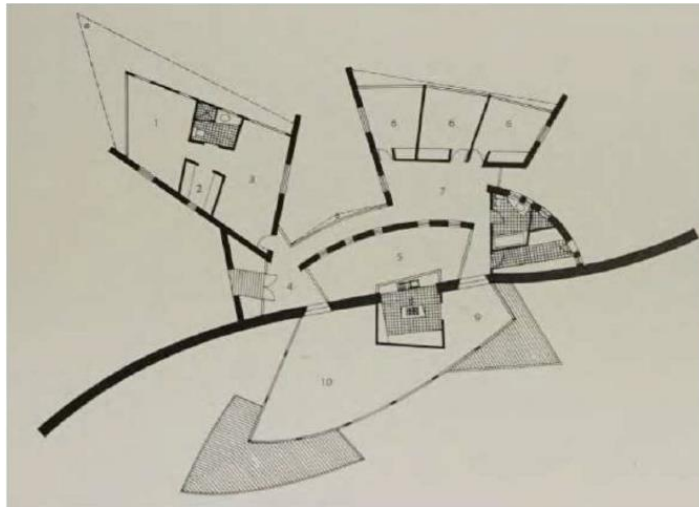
A floor plan of the [REDACTED]. The numbers designate the following: 1 Master bedroom; 2 Dressing room; 3 Study; 4 Entry; 5 Courtyard; 6 Bedrooms; 7 Play area for children; 8 Kitchen; 9 Dining area; and 10 Living area. (Source: Jahn 1996:171)
